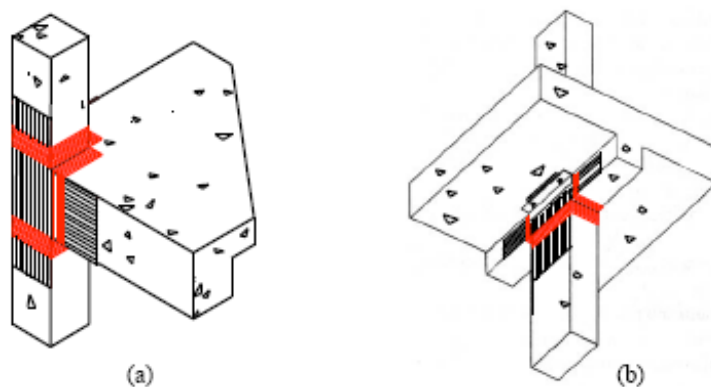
Typical composite material configurations for beam-column joint strengthening, a) external, b) interior joints [35]
